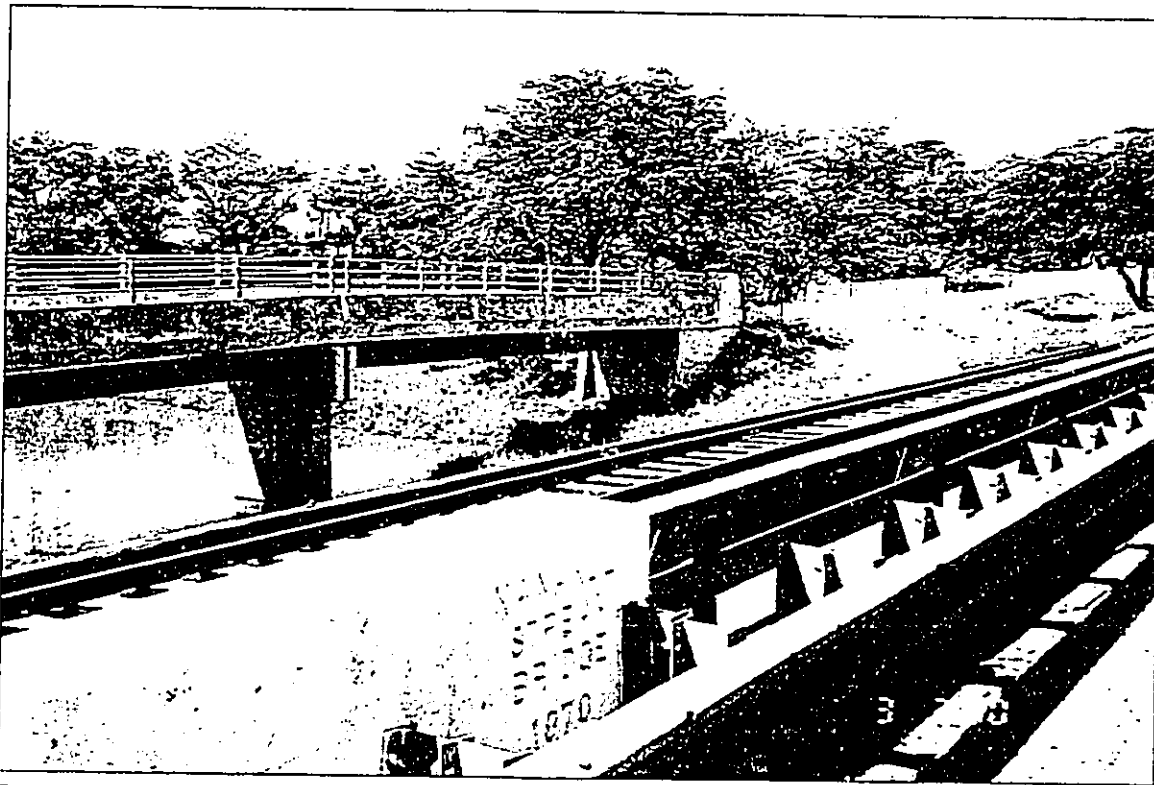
View of Nanakuli Stream looking northwest at the footbridge, railroad tracks and bridge for the road.
